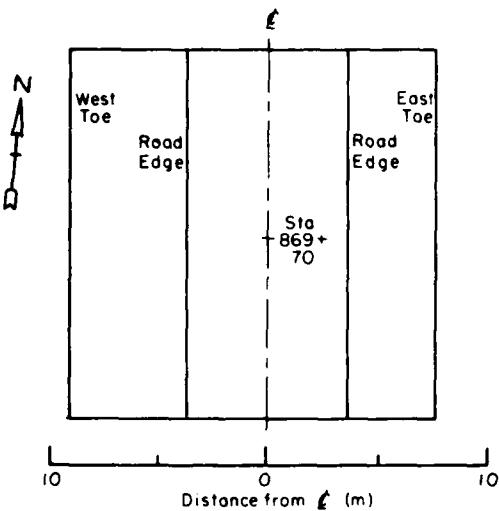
Plan view of the TAPS Road mile 16.3 site.
